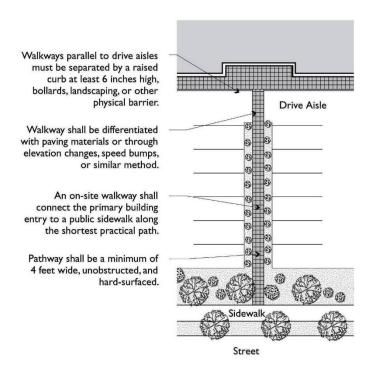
A: PEDESTRIAN ACCESS THROUGH PARKING AREA
